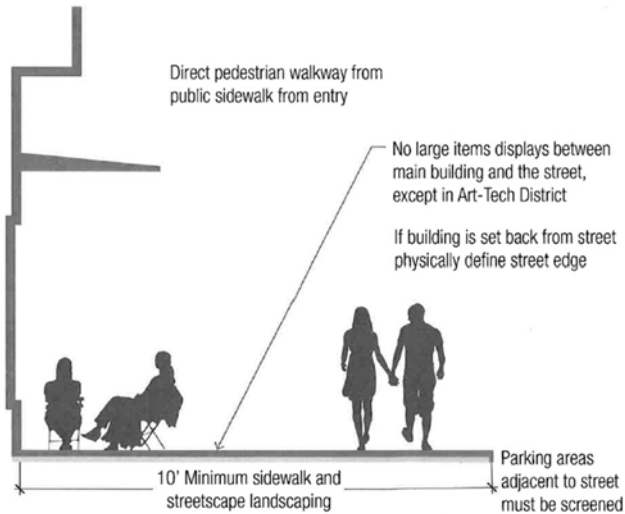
E.1: Requirements for development adjacent to Type C Streets (this diagram is for illustrative purposes only. See section 18.120.220.E for applicable requirements).
